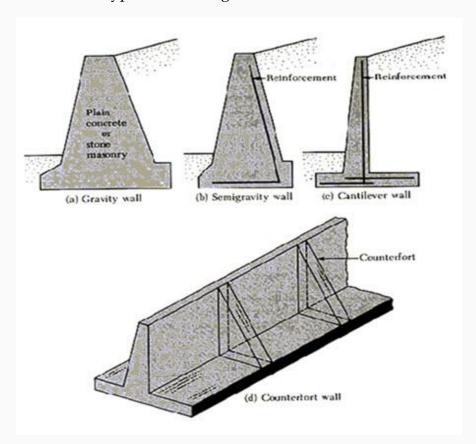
Types of retaining wall. (Source: https://www.concretenetwork.com)
